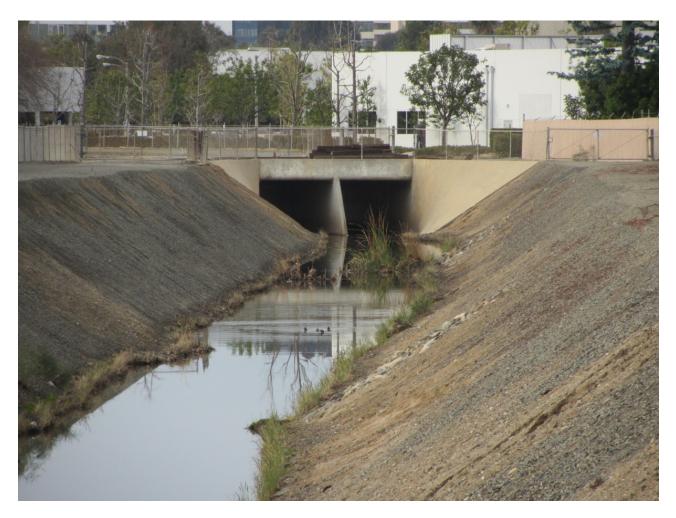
View of Barranca Channel at the entrance to the RCB under the AT&SF Railroad Spur. This RCB is located upstream of the proposed Kelvin Pedestrian Bridge location. (Approximate capacity of 750 cfs.) Note restriction of existing box culvert at Barranca Channel.
